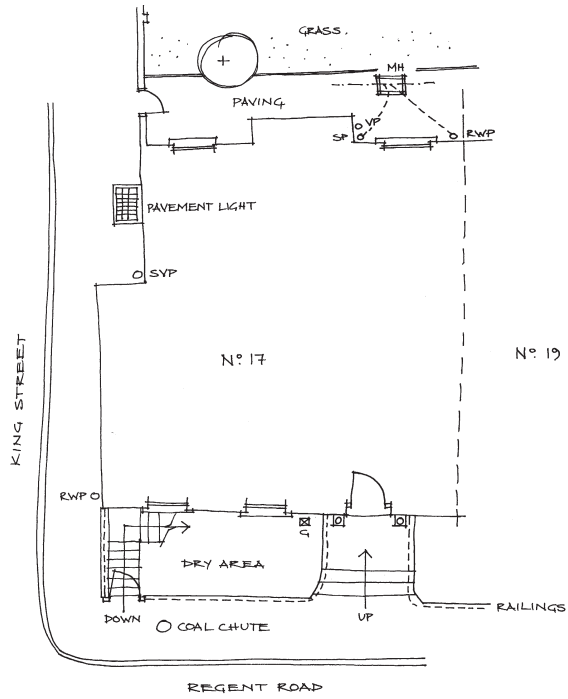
(a) Ground floor plan. Stage 1 sketched externally.
